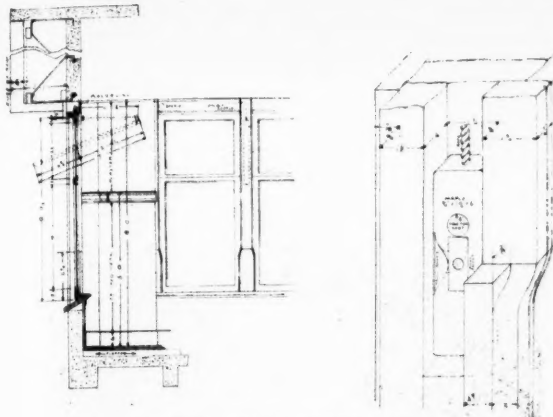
WINDOW DETAILS, HOBOKEN SIGNAL TOWER
